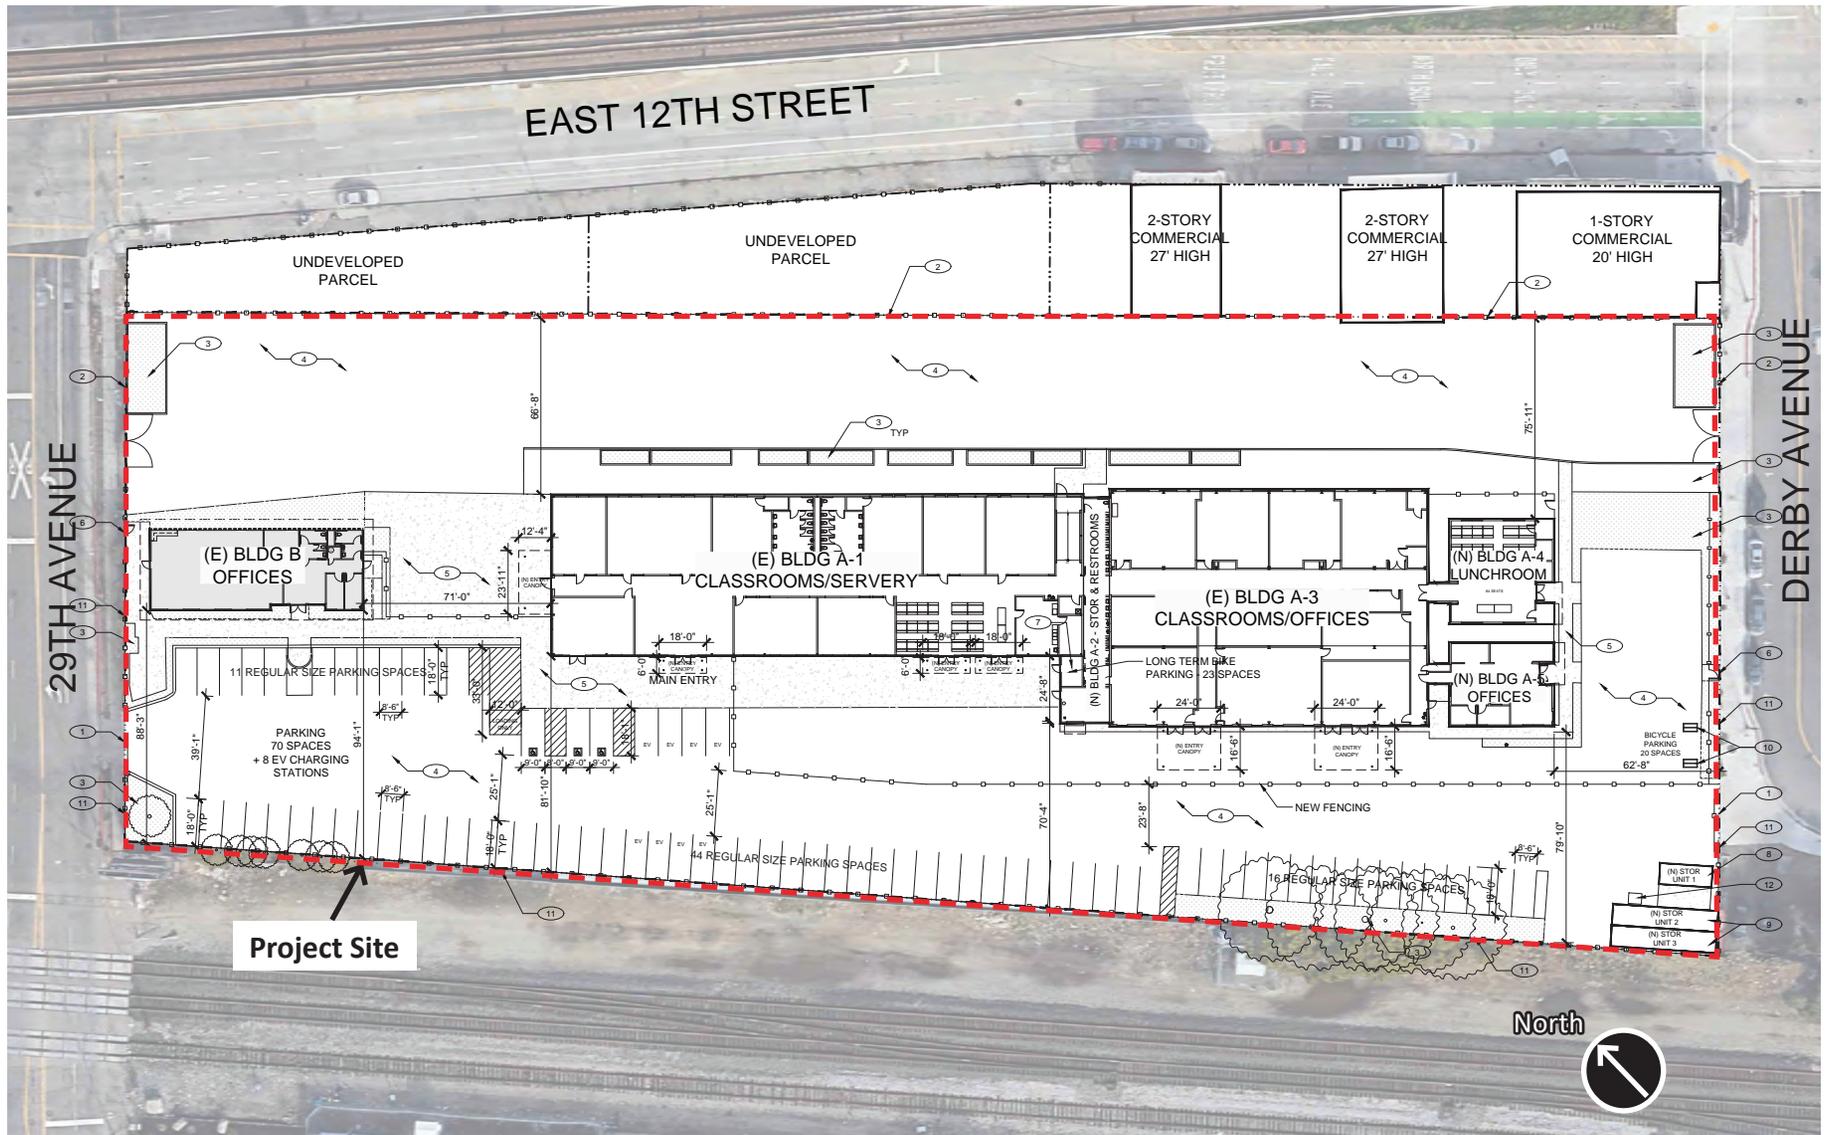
Phase 1 Site Plan, EFC Latitude High School
